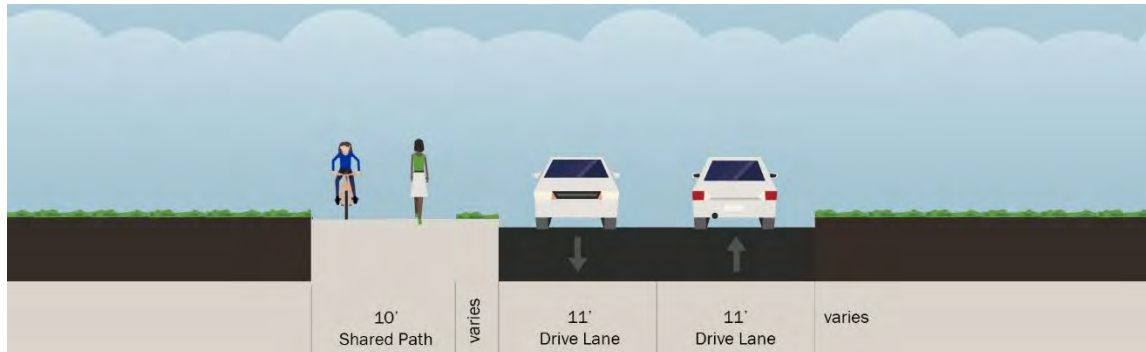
Hoffner Avenue (western section looking west) Cross-Section
